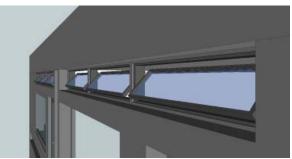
LAMELLA WINDOWS IN EXTERNAL FACADE.
